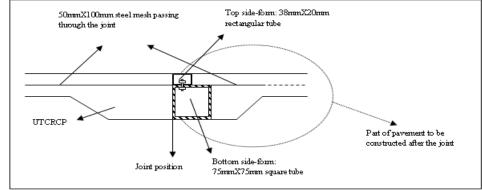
Sketch of form-work of joint with reinforcing mesh trough it (type 2 longitudinal joint)
